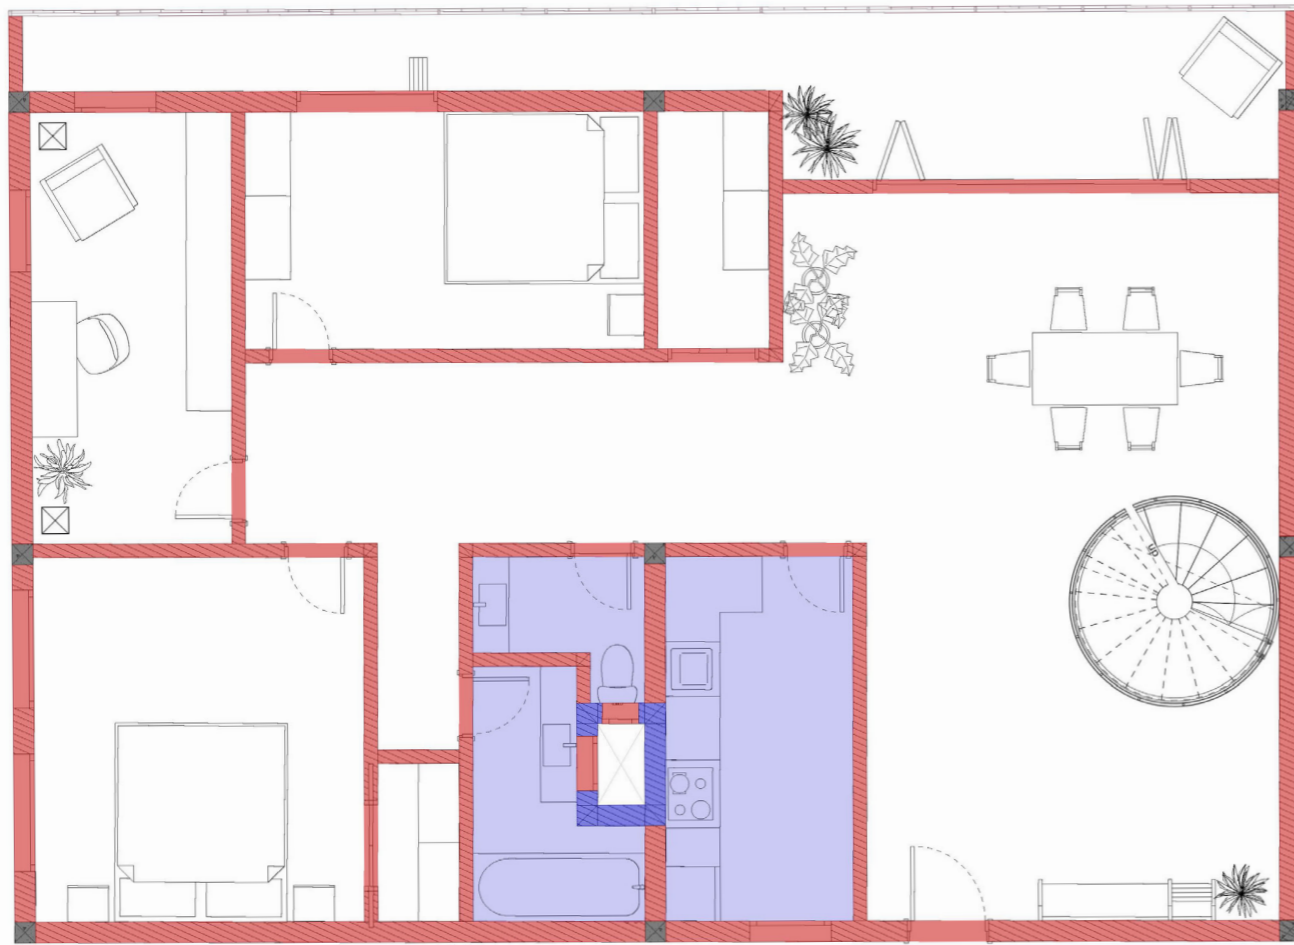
, Groundfloor of a type E apartment (author's work, 2026)
